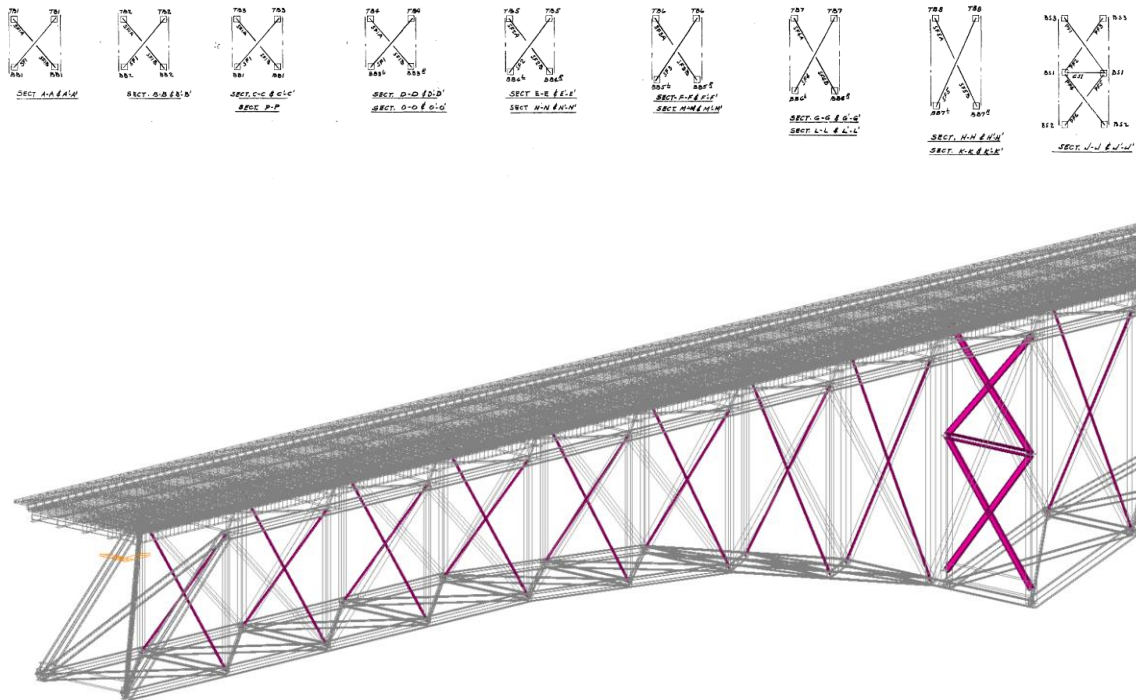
View of sway bracing: technical drawing (left) and FE model (right) - Truss_3.
